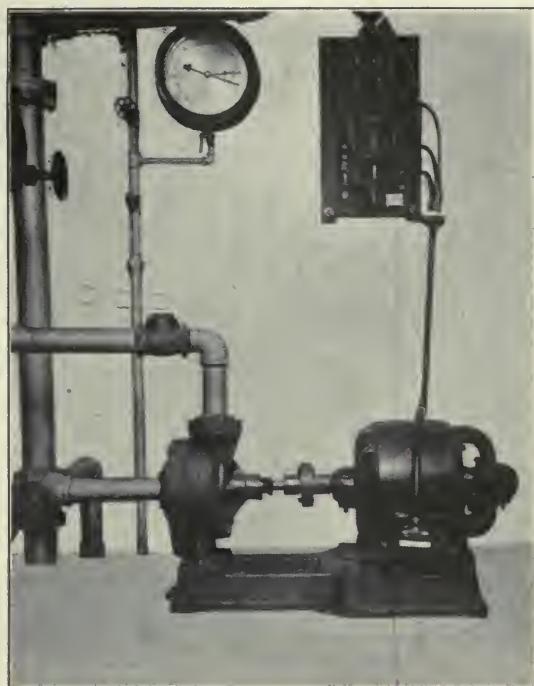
Centrifugal Motor Driven "House Pump" with automatic control and pressure gage.
